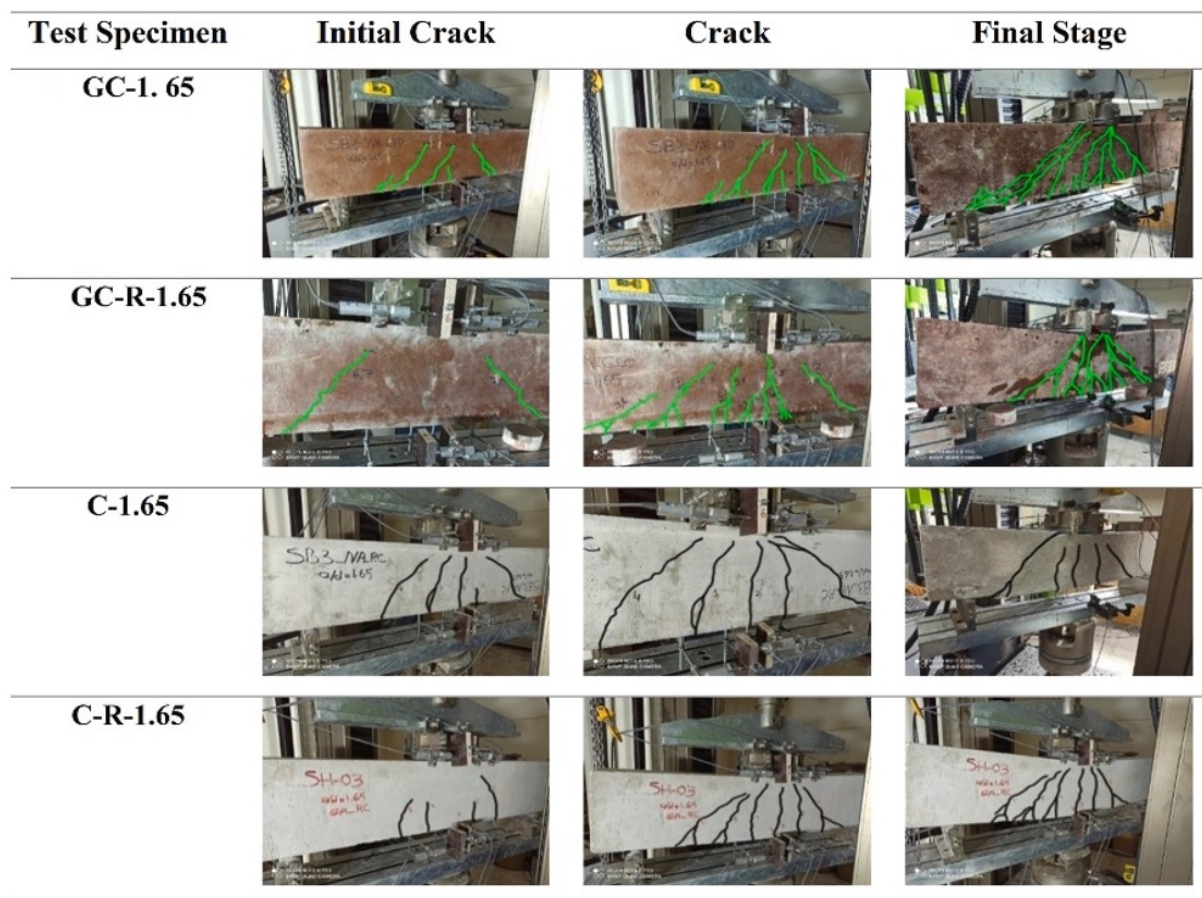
Pattern of crack propagation of CDW-based geopolymer and OPC concrete beams, GC: Geopolymer concrete; GC-R: Geopolymer concrete with recycled concrete aggregates; C: Conventional concrete; C-R: Conventional concrete with recycled concrete aggregates [83]
